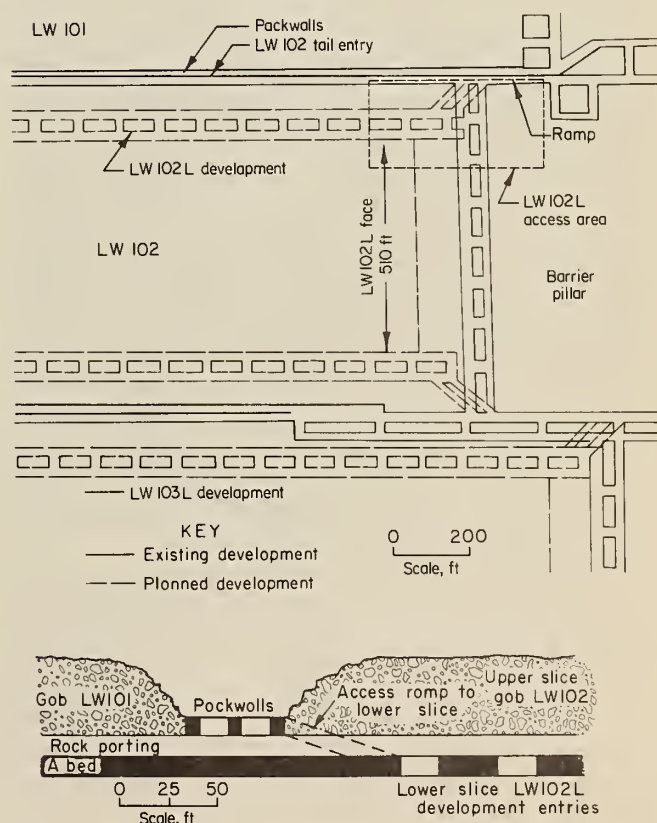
Layout of planned multislice trial. A, Map view; B, cross section of access area parallel to longwall face.
